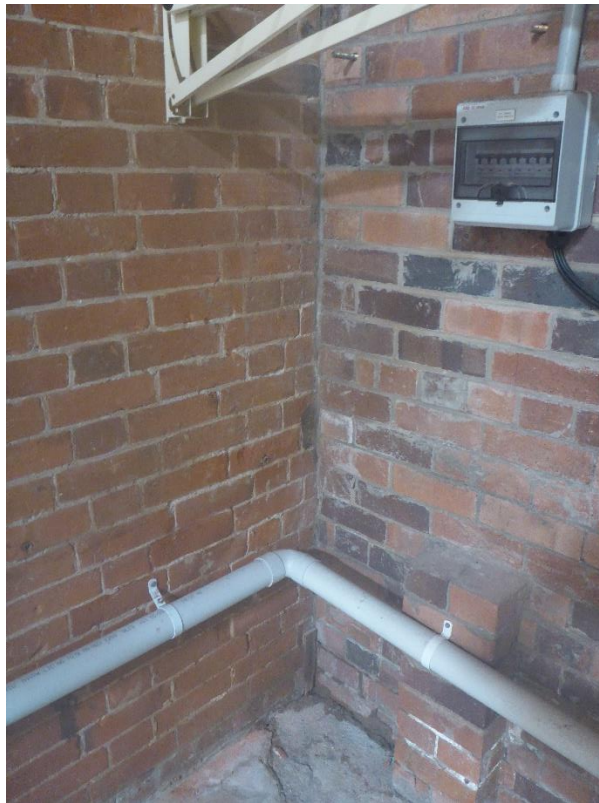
A detailed view of the intersection between the original face brickwork of the side (party) wall – at image left – and the newer brickwork of the rear infill wall – at image right. (Source: VAULT)
